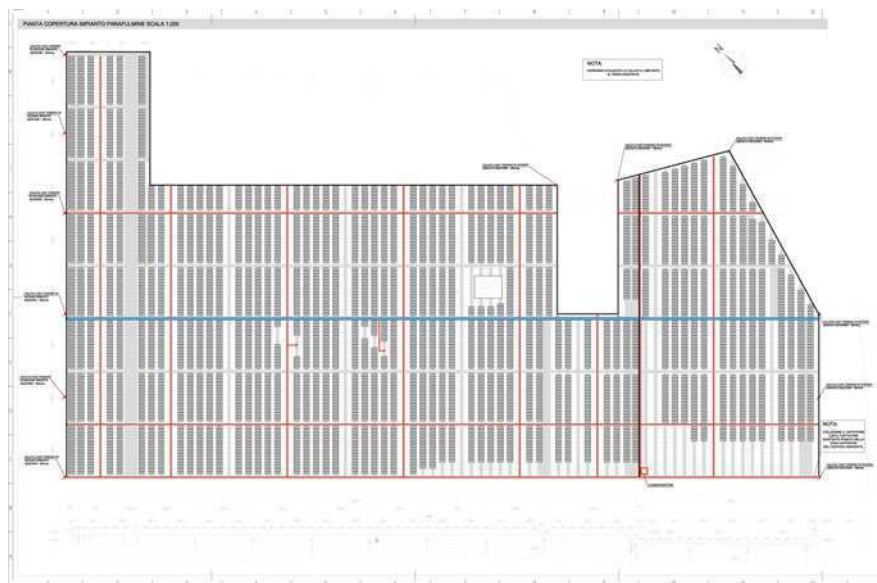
Plan diagram detailing the layout of the 5,104 roof mounted modules (reproduced by kind permission of the MezzaCorona group)
